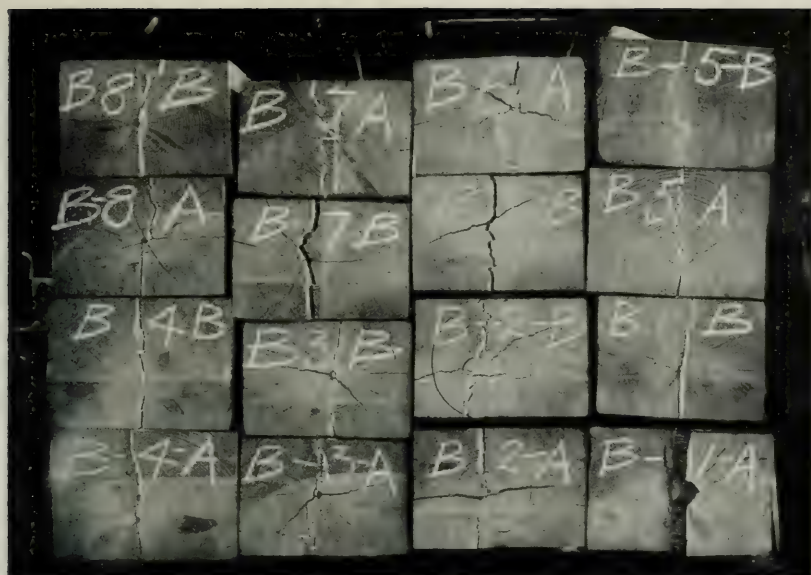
VIEWS OF SHEAR BLOCKS AFTER FAILURE.
